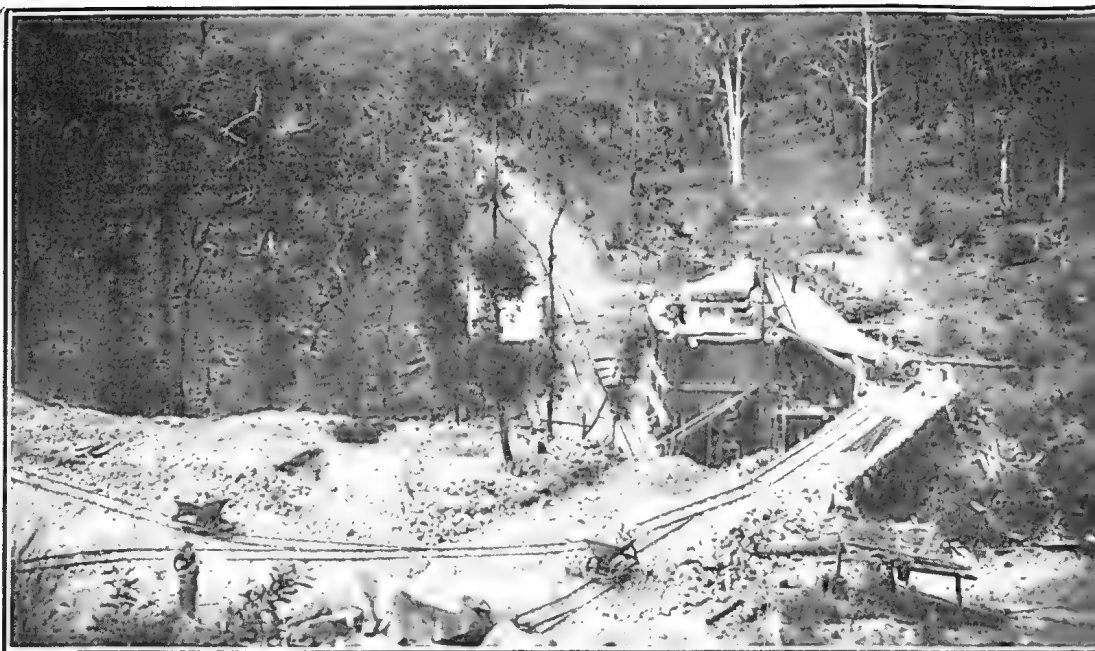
QUARRY PLANT AT BEERBURRUM, SHOWING LIGHT TRAMWAY CONNECTING WITH NORTH COAST RAILWAY. HAULAGE IS BY MOTOR CYCLE ENGINE ON A TRUCK FRAME.
